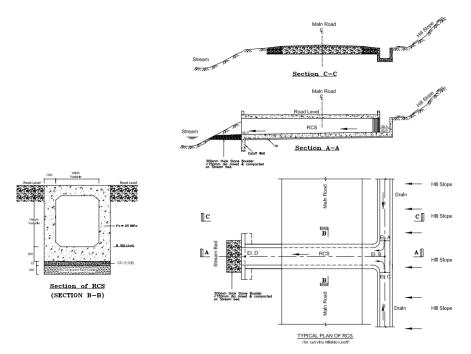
Typical Section for Hill Side Road Crossing Structures
